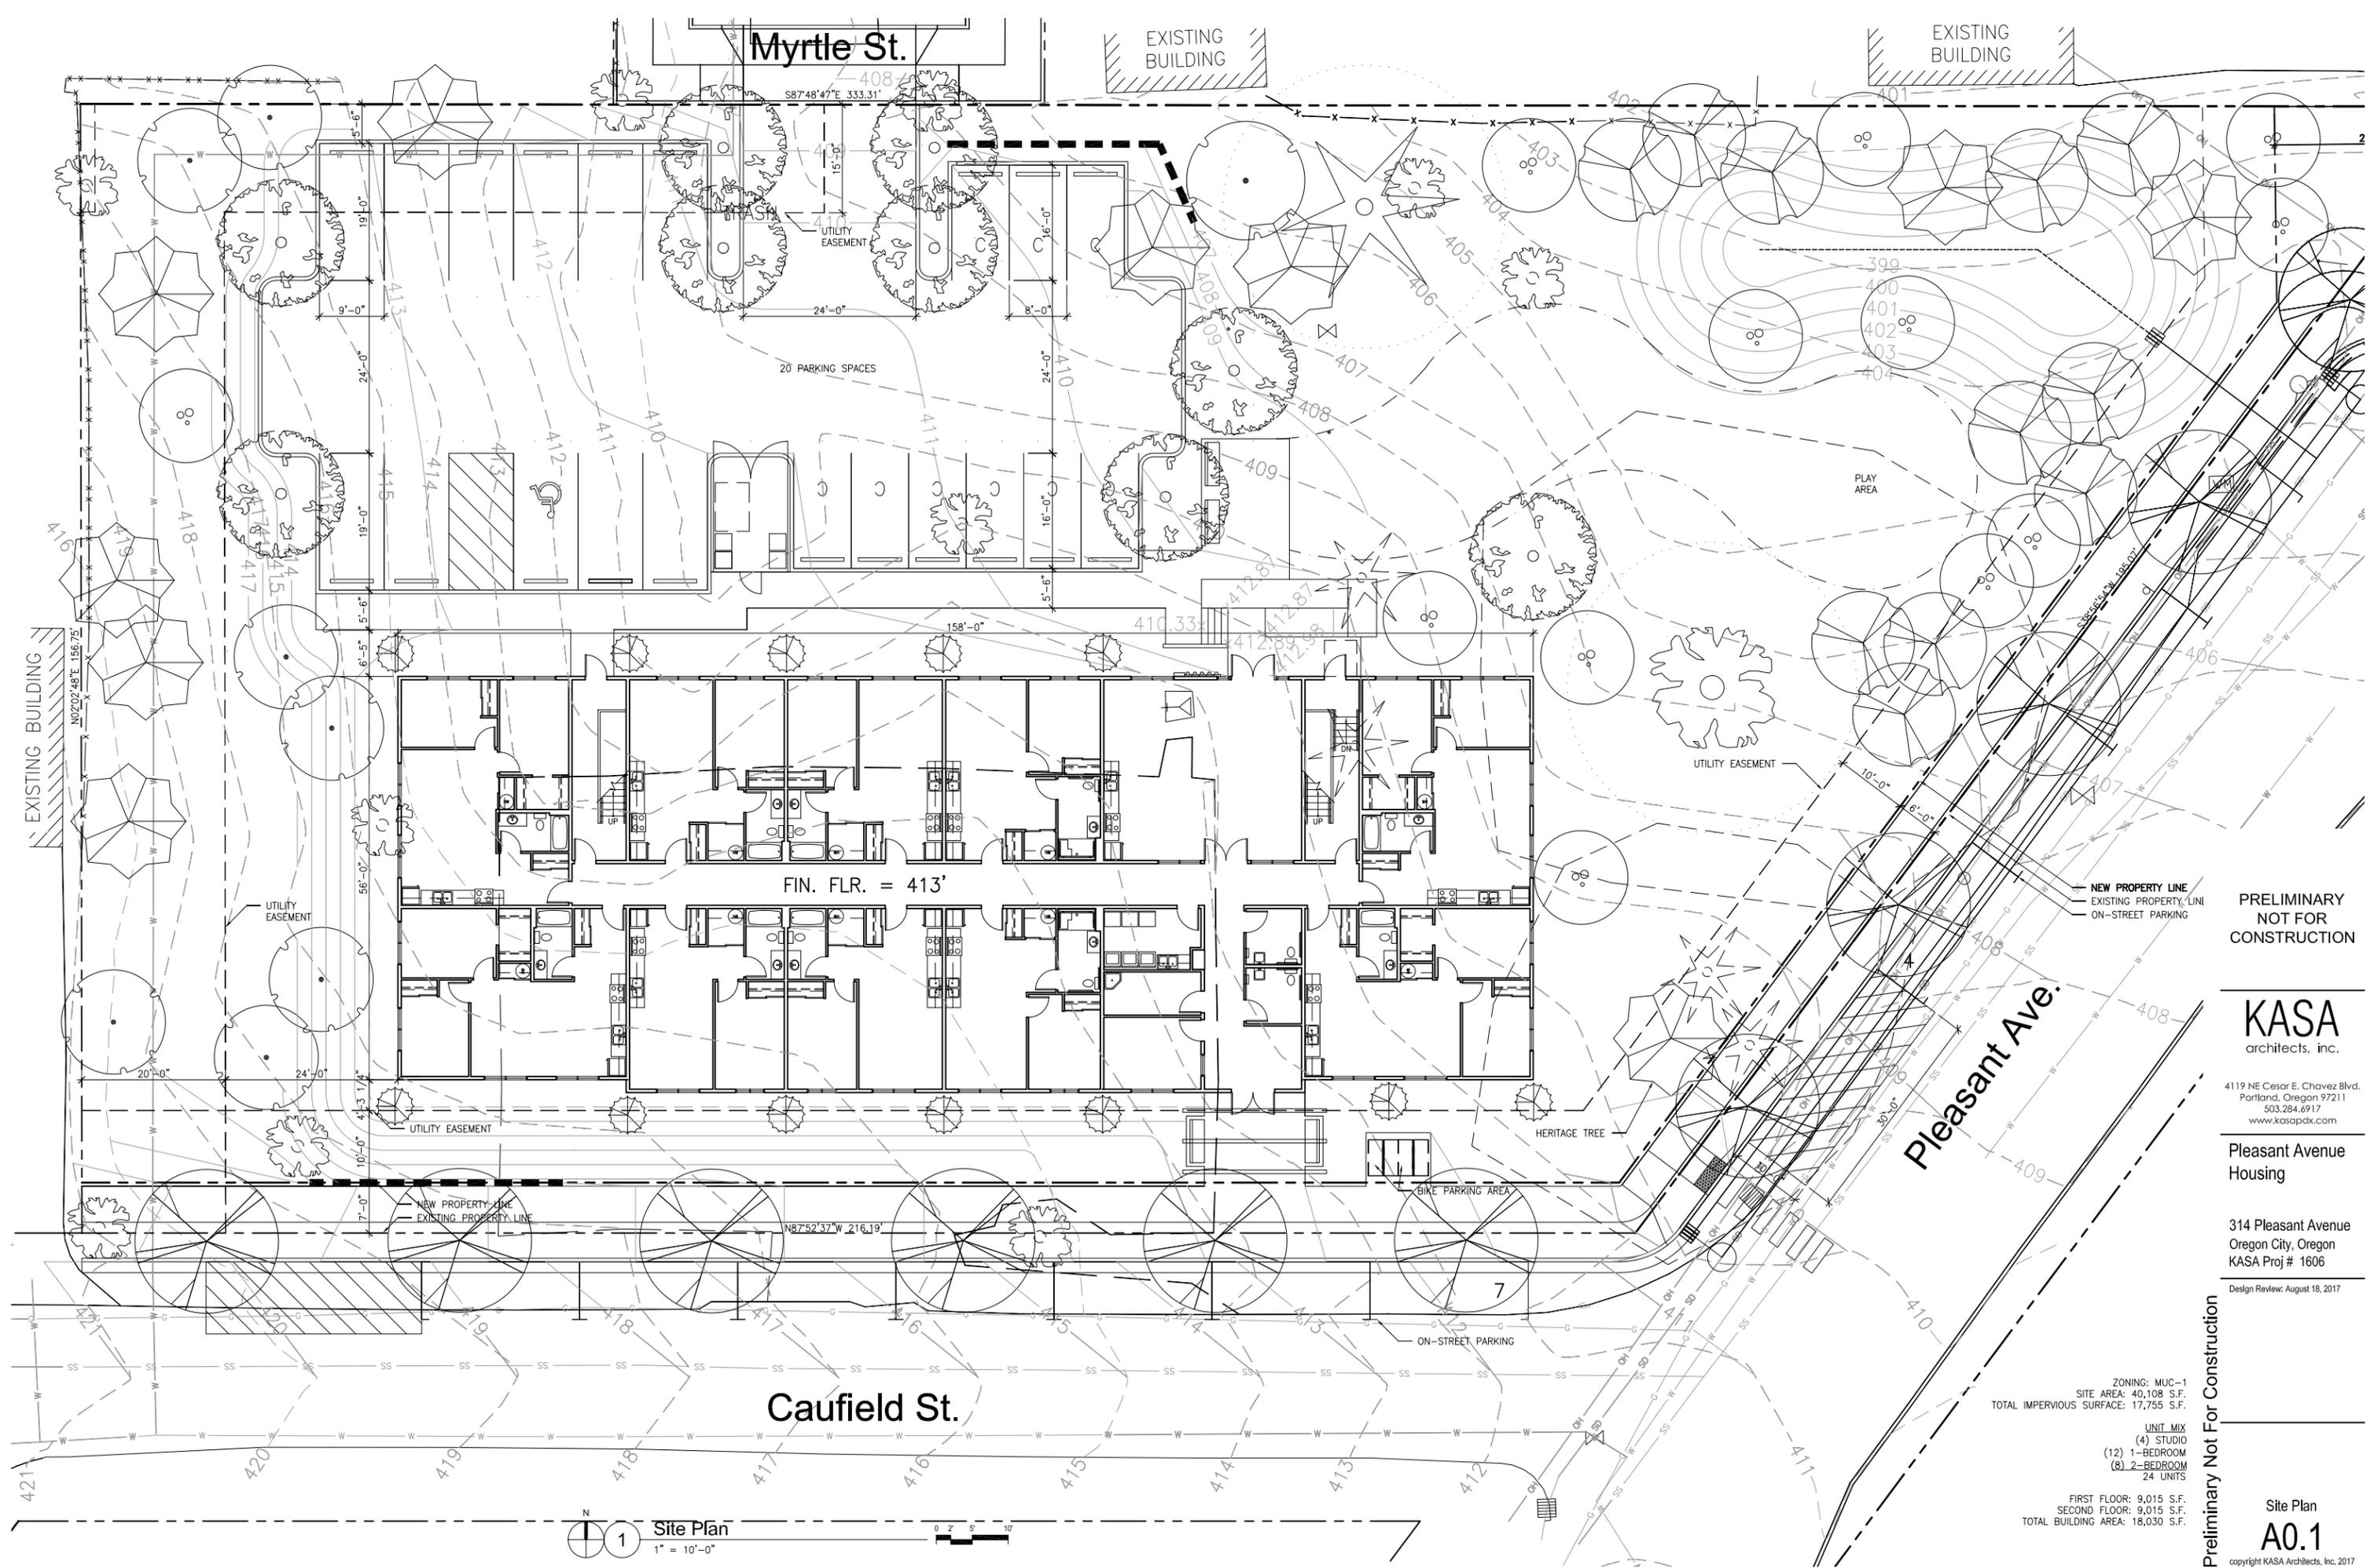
illustrates a site plan showing the proposed Pleasant Avenue Housing residential structure and parking lot. Figure 2 illustrates the location of the site in relation to adjacent properties and their access driveways. As shown, vehicular access to the site is proposed via a driveway that would be placed at the southerly tip of Myrtle Street. This driveway location would not conflict with any other driveways on adjacent properties.
